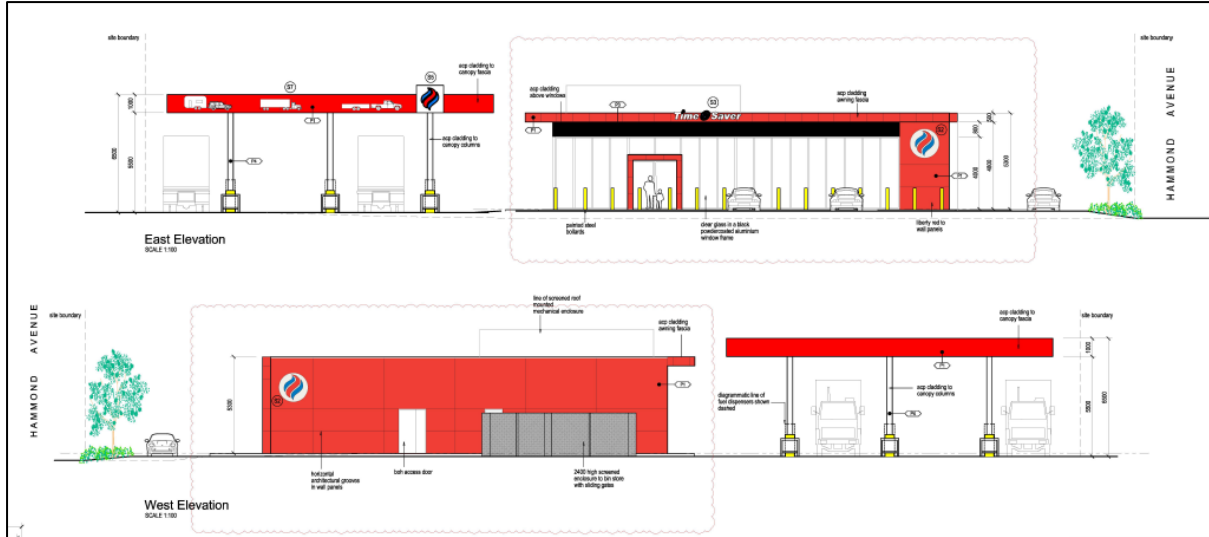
PROPOSED EAST AND WEST ELEVATIONS (MCL BUILDING DESIGN)
